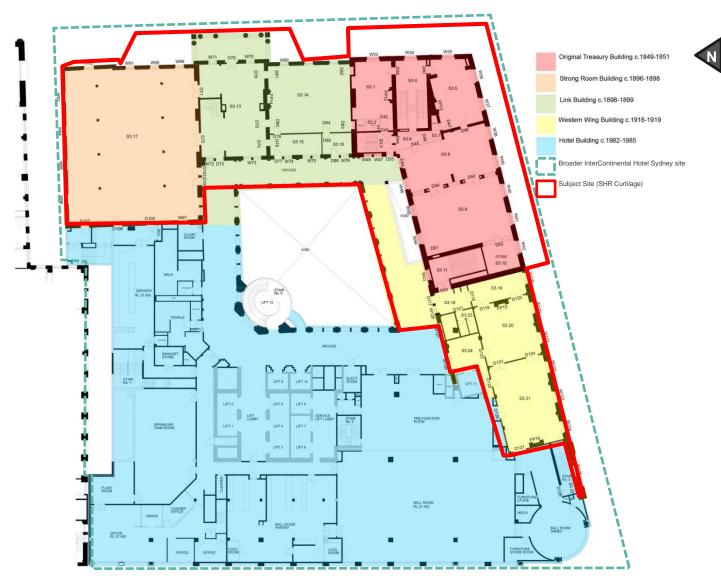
Extract of 'as built' plans showing period of construction – First Floor
